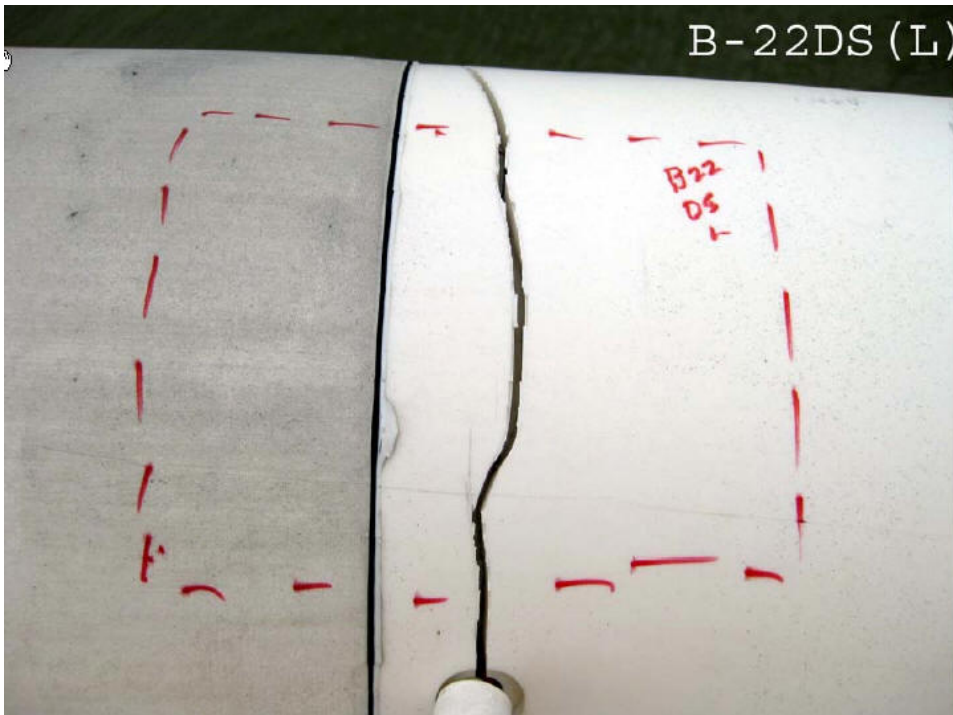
Crack in Connection Sleeve Coupler at Cable B22D. Note Inked Cutting Outline.
